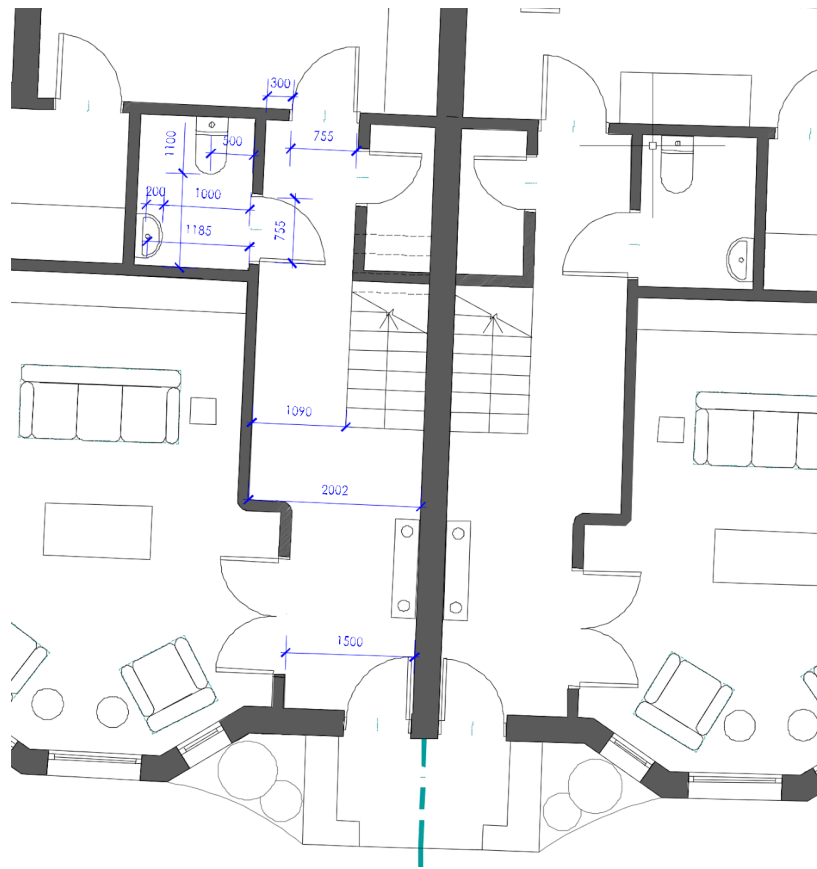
Sample plan of the proposed upper ground floor circulation space, min 1090 mm wide. Extract from drawing 2041.03.03.Plh01.022.
